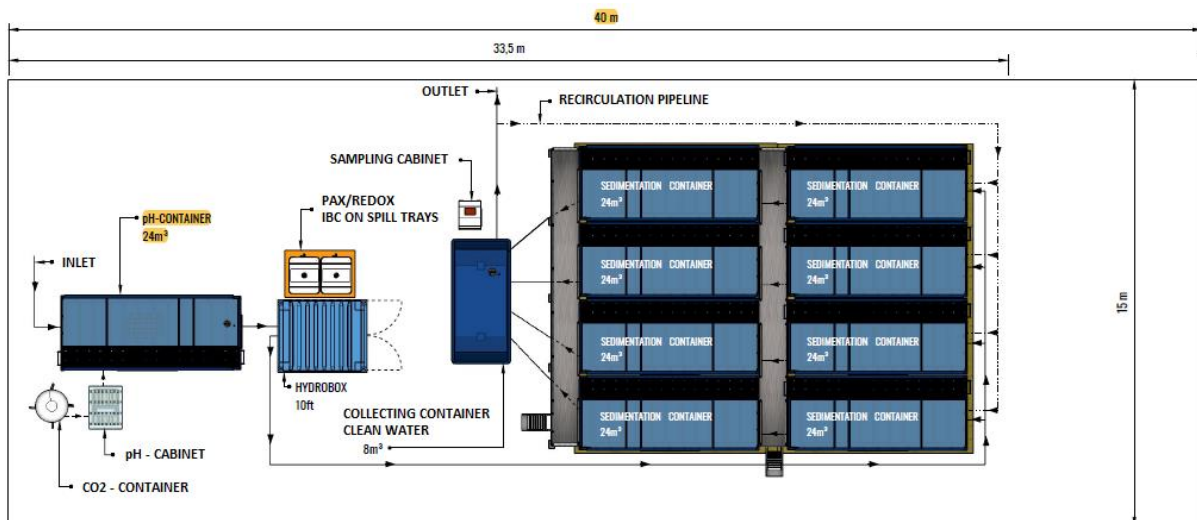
Detailed plan of complete water treatment system (Nilsson, 2024).
